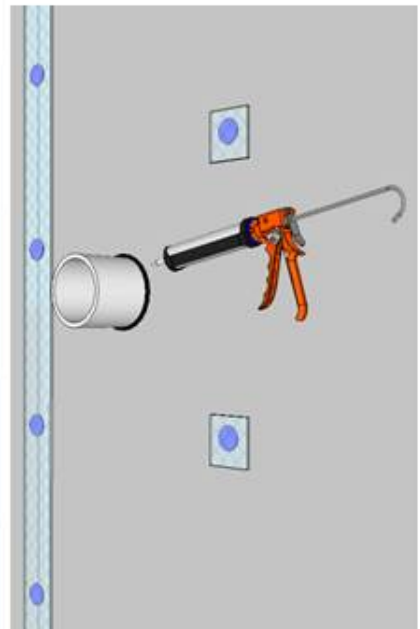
TYPICAL PENETRATION FLASHING DETAIL - FLANGED
